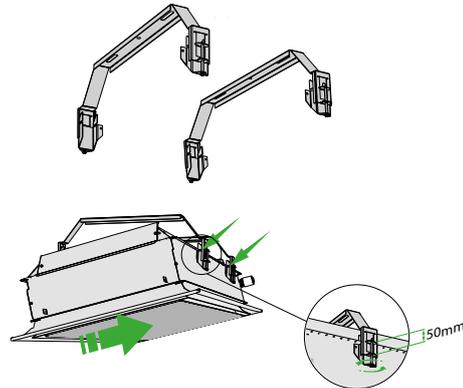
Installation with quick bracket PARASOL Z QUICK SUSPENSION KIT
